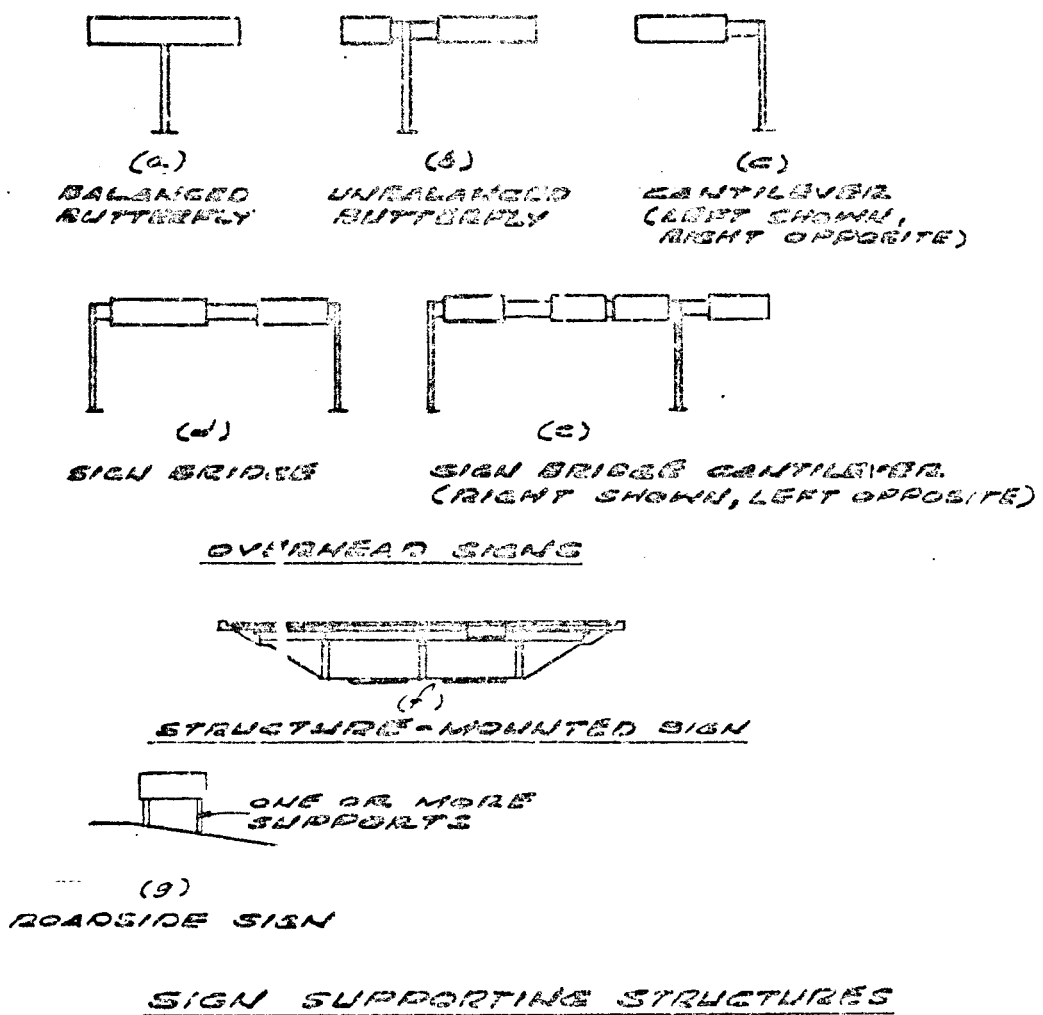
SIGN SUPPORTING STRUCTURES DEFINED IN AASHO SIGN SUPPORT SPECIFICATIONS⁽³⁾
